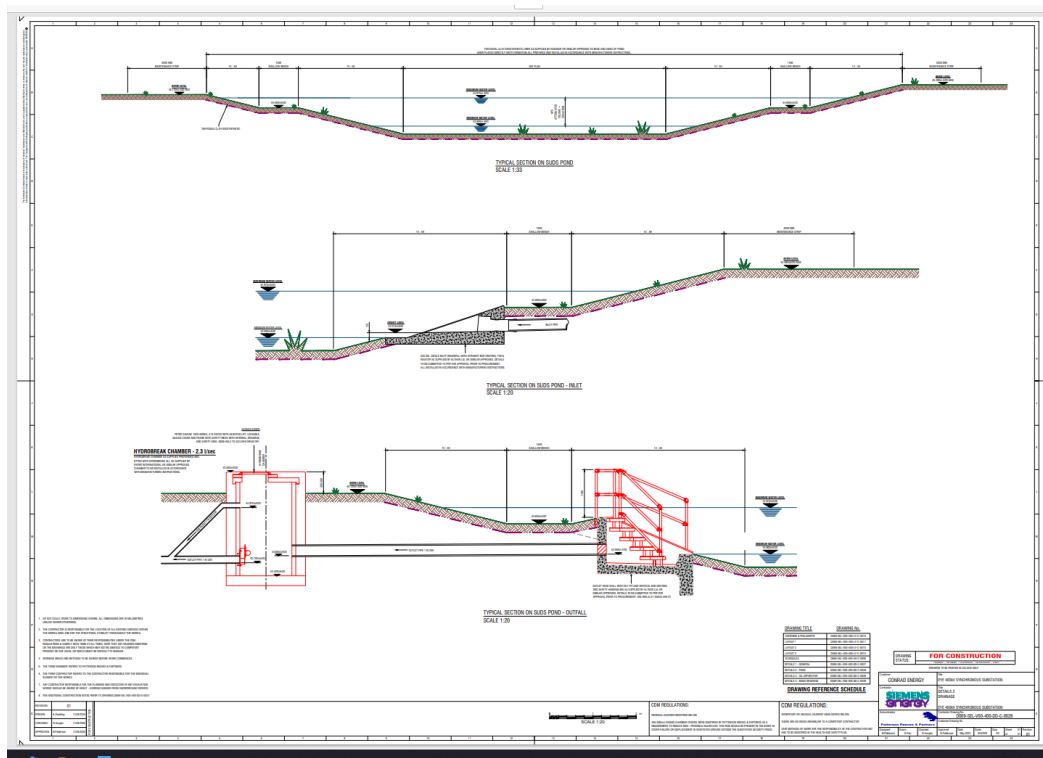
Drainage Plans – Cross Sections of Attenuation Pond (Drawing ref: D069-SEL-V00-400-DD-C-0028)
